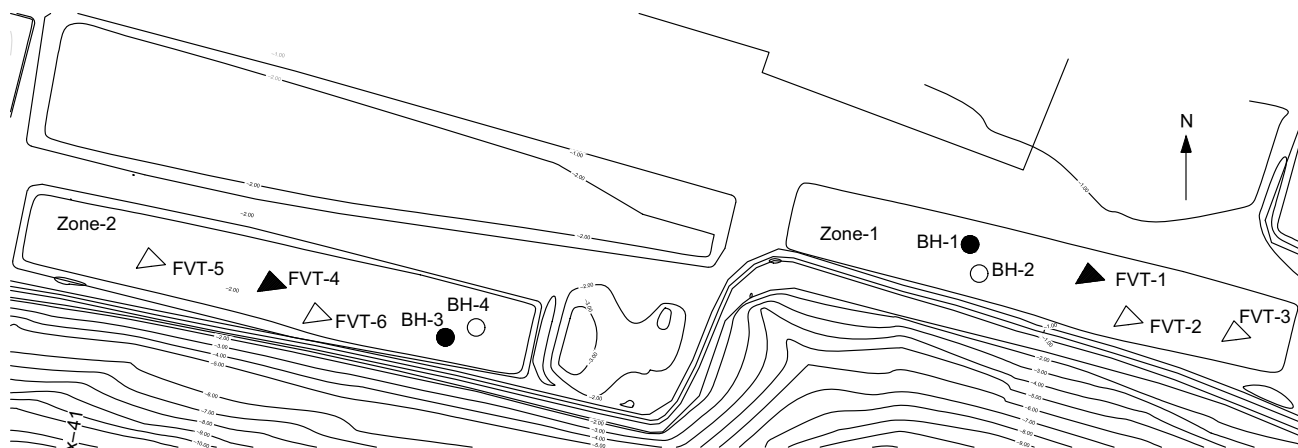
Contours and field investigation layout of Zone 1 and Zone 2
